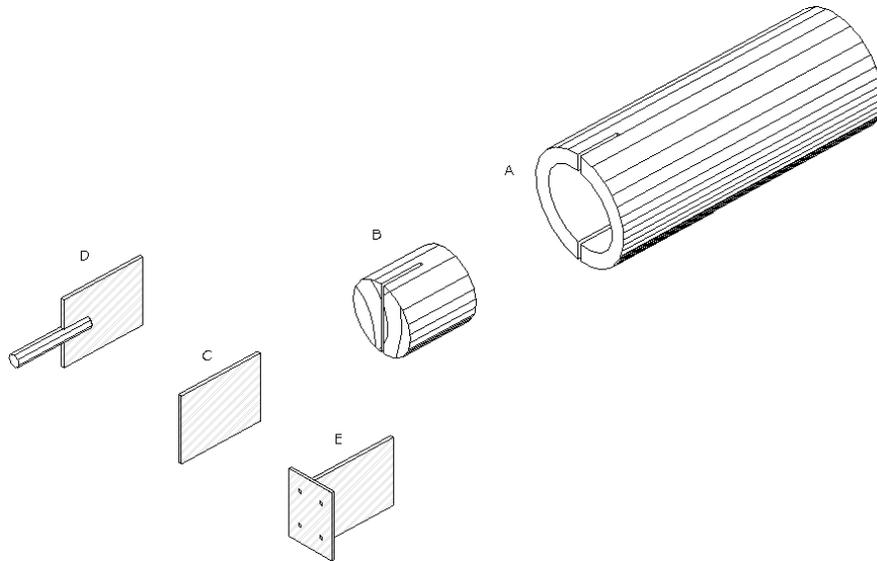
Glued-Wood Fitting with Steel Plate Connection
